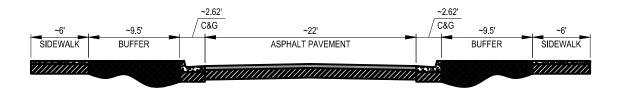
EXISTING LUNA BOULEARD TYPICAL SECTION
